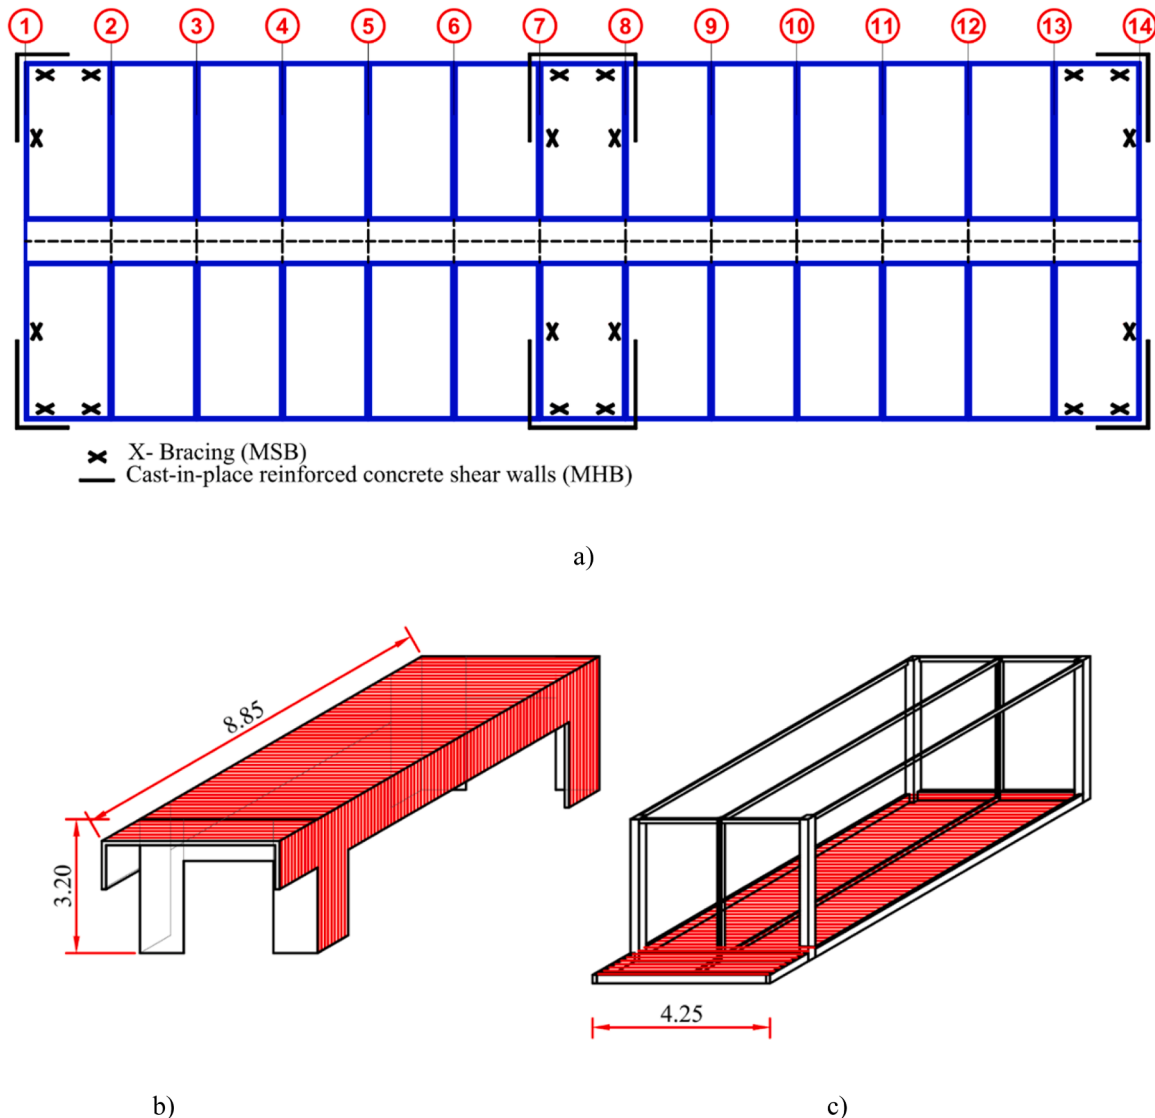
a) Plan of the case study building, b) Alternative geometry MCB, c) Alternative geometry MSB and MHB. Dimensions in meters.
